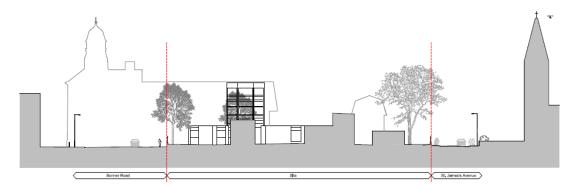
Existing site cross section - Bonner Road to St James's Avenue
